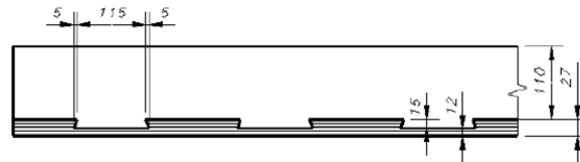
timber (LVL)-concrete connection with grooved indentations in the LVL (after Van der Linden) (dimensions in mm)
